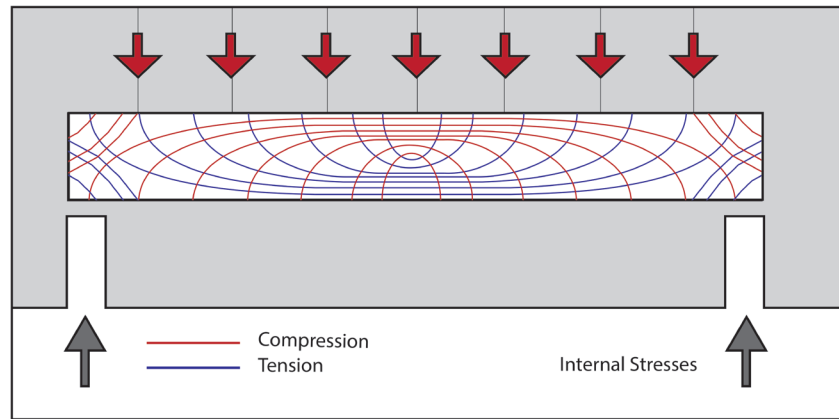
States of stresses in beams: Bending, compression, tension, shear, and torsion
